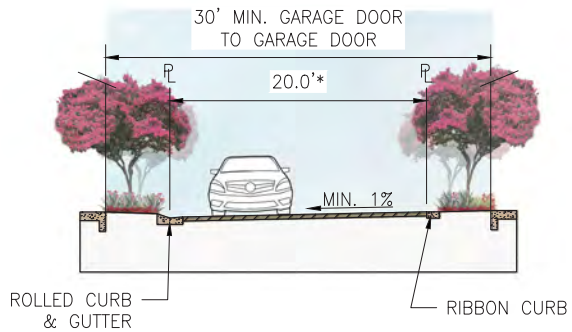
Typical Private Street Cross Sections illustrates the minimum design standards for each type of street.
